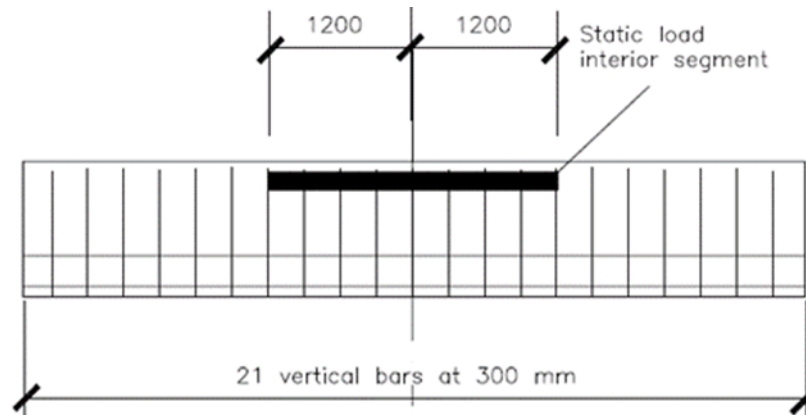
Elevation of front vertical reinforcement arrangement for barrier specimens S-3 and S-4 with interior loading
